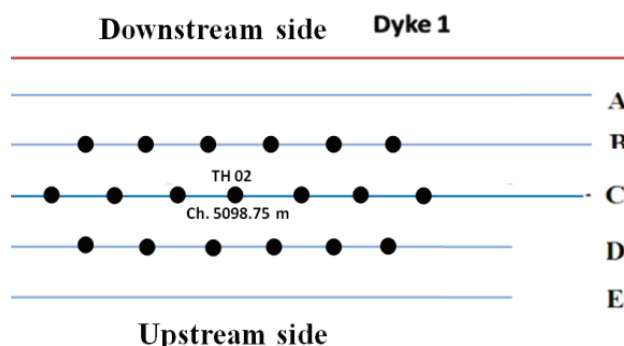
Sketch showing re-grouting locations at Ch. 5098.75 m
